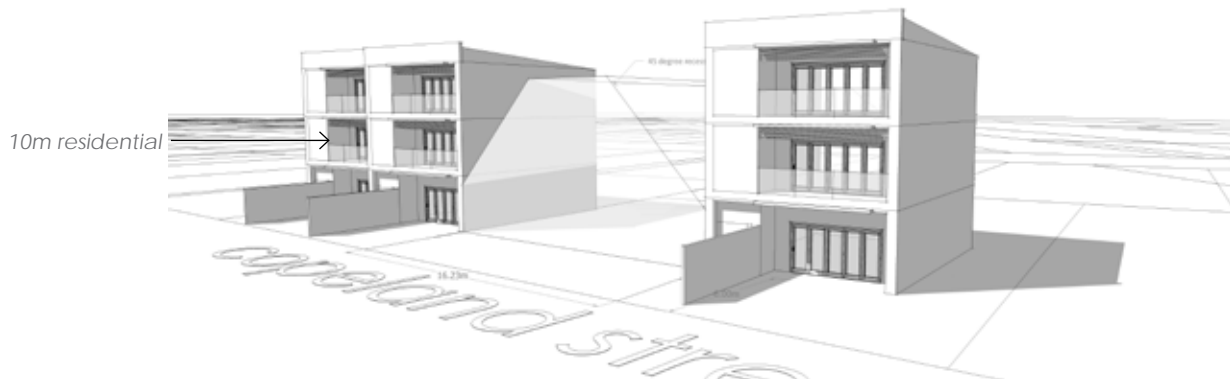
EXISTING RECESSION PLANES WITH THE REMOVAL OF THE STREET FRONTAGE RECESSION PLANE
